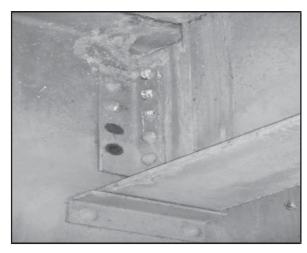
Missing and Broken Fasteners at Stringer-to-Floor Beam Connections
